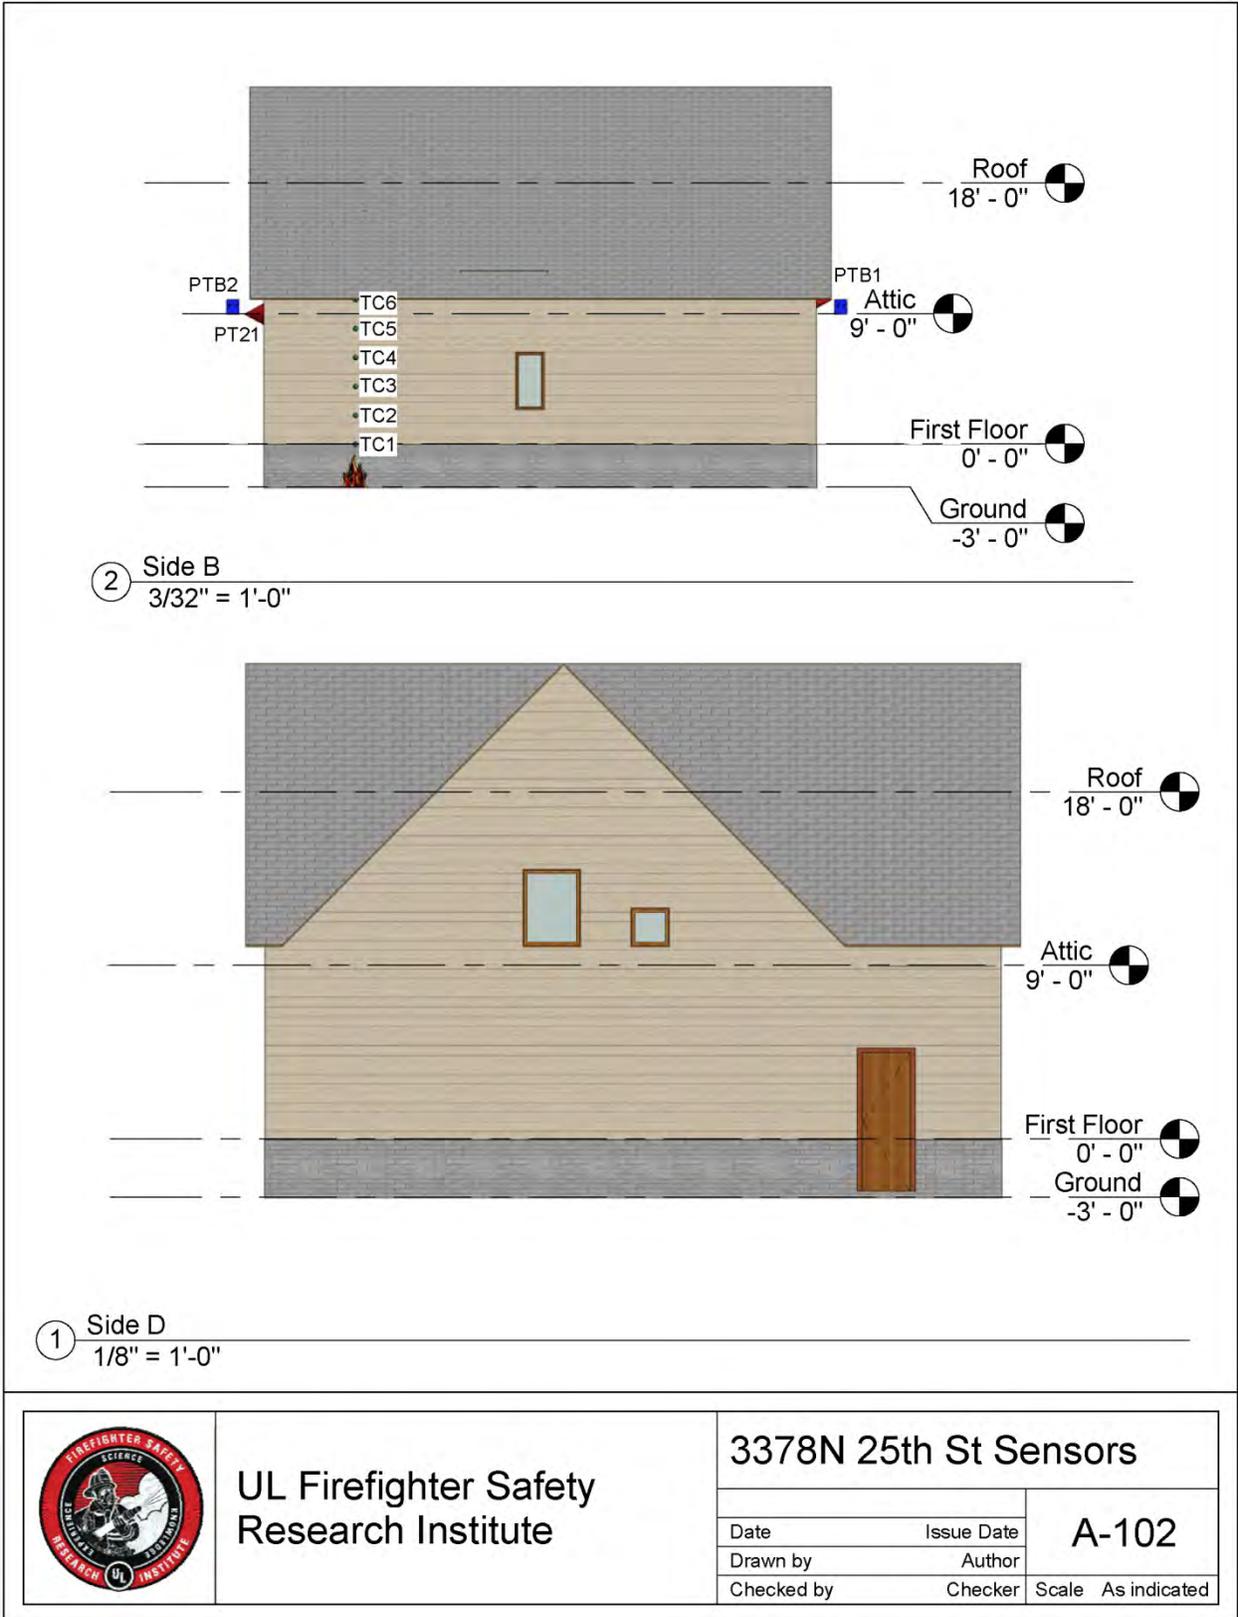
Field Experiment 3 – 3378 N 25h Street Sensors Side B & Side D Elevations
